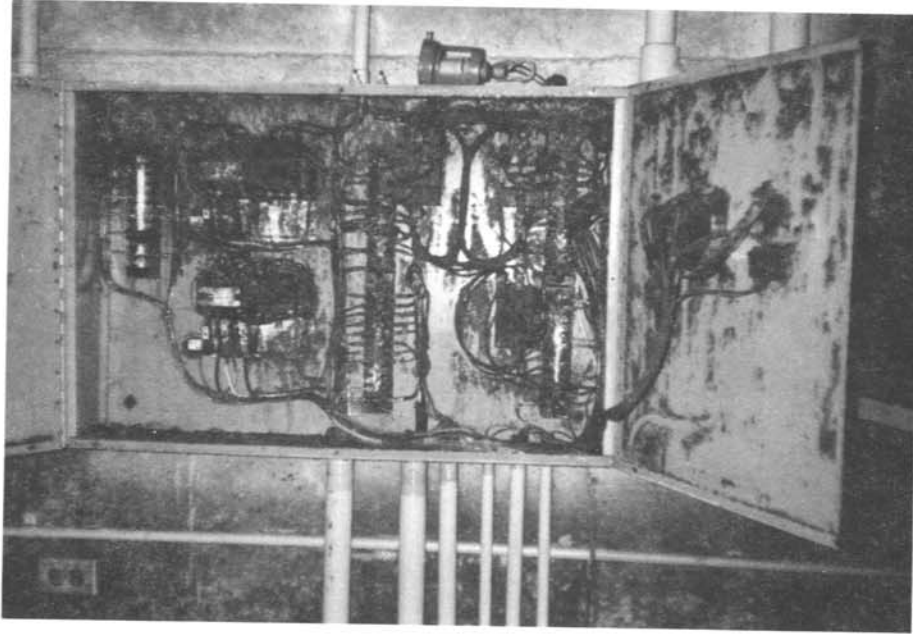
Unit 2—Flooded electrical panel prior to cleanup. 1/18/91
